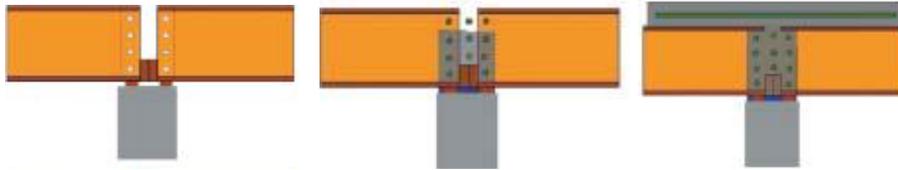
Making a continuous beam with concrete diaphragm [2].
